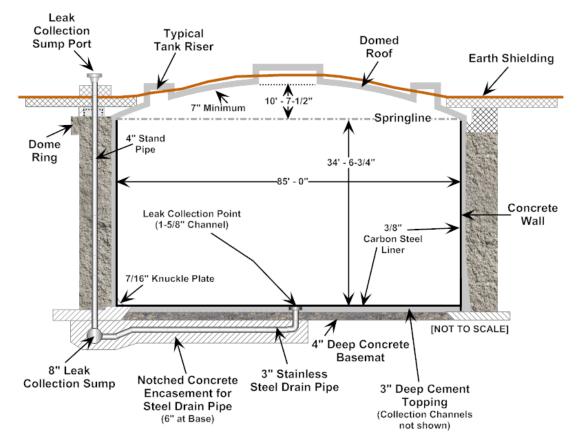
Cross-Sectional View of Typical FTF Type IV Waste Tank
